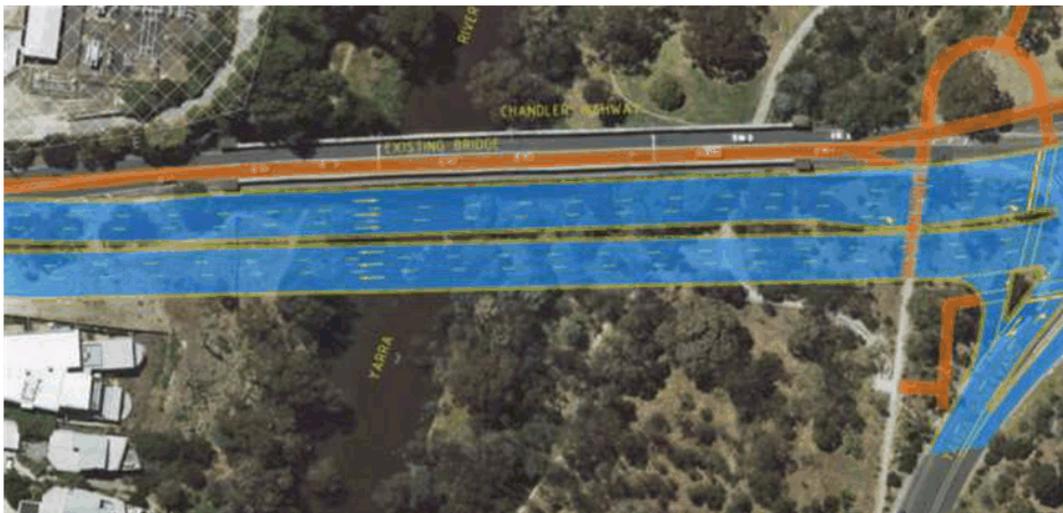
Proposed new bridge alignment in relation to existing bridge (source VicRoads)
